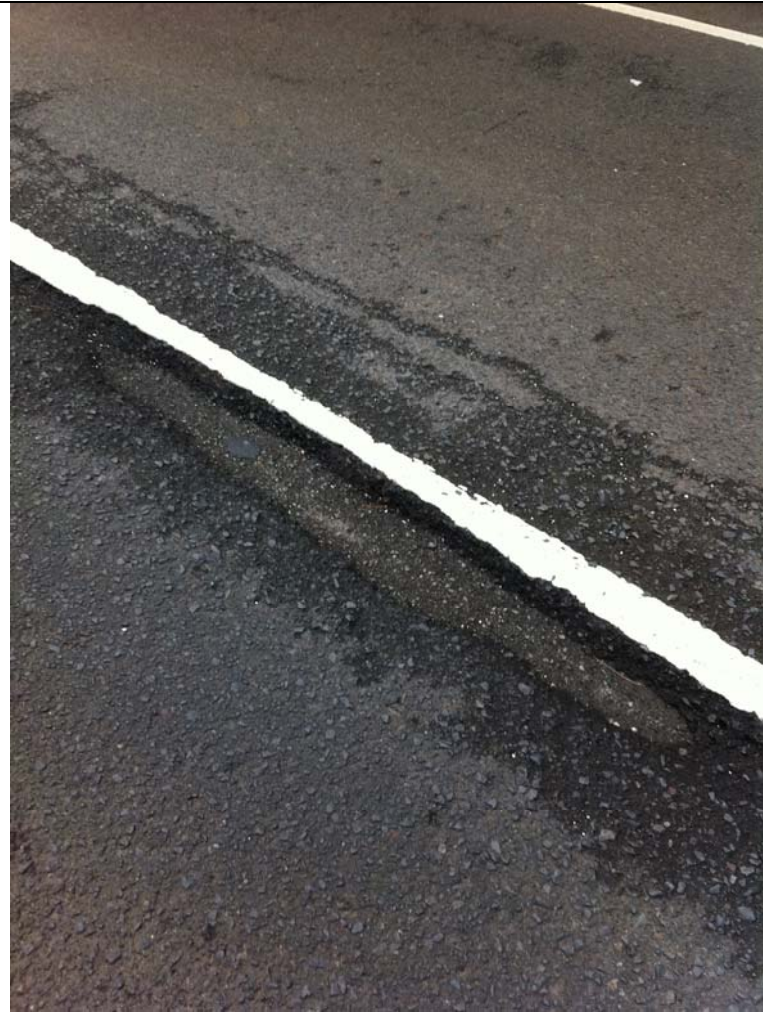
Deteriorated pavements with asphalt and concrete patches.
